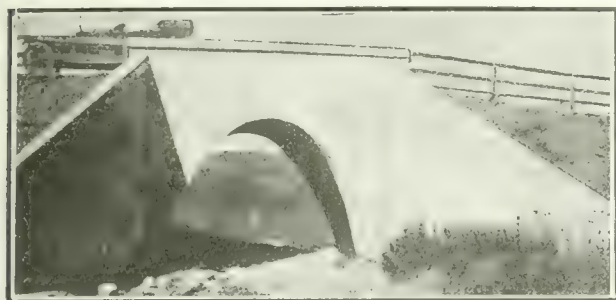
A 20-foot Concrete Span Over Gibson Creek, Sask.
